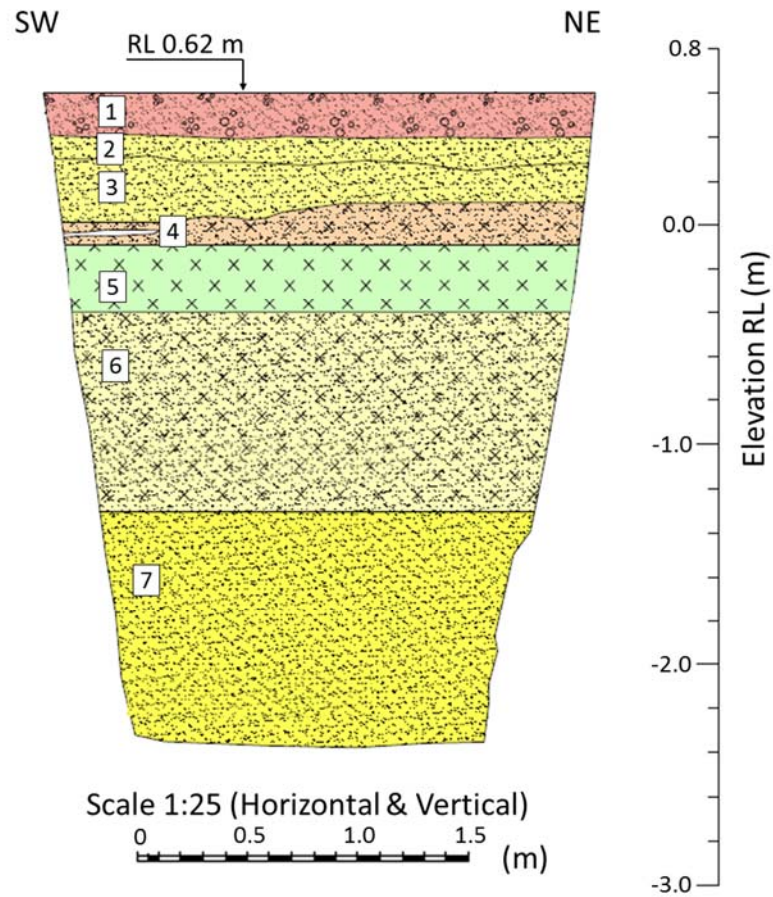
Cross-section of excavation trench at the 6-RIC-1 Test Panel. Modified from van Ballegooy et al. 2017.
